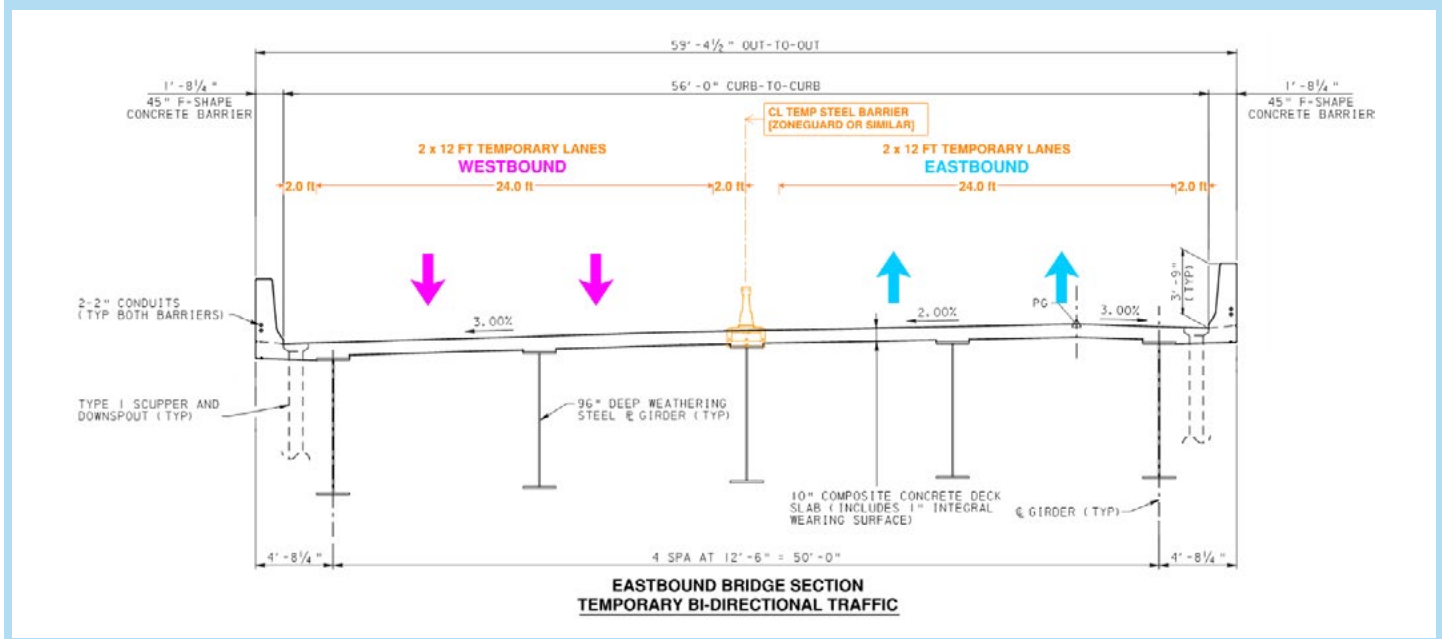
ALTERNATIVE TRAFFIC CONTROL WITH CONCURRENT EXISTING BRIDGE REMOVAL AT I-80 CANOE CREEK BRIDGE
